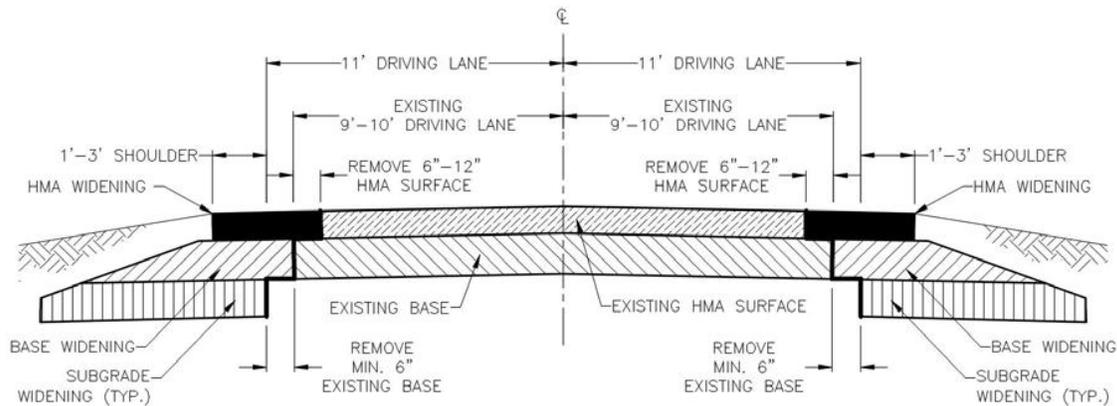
Cross-section of widened lanes illustrating stair-step design.
